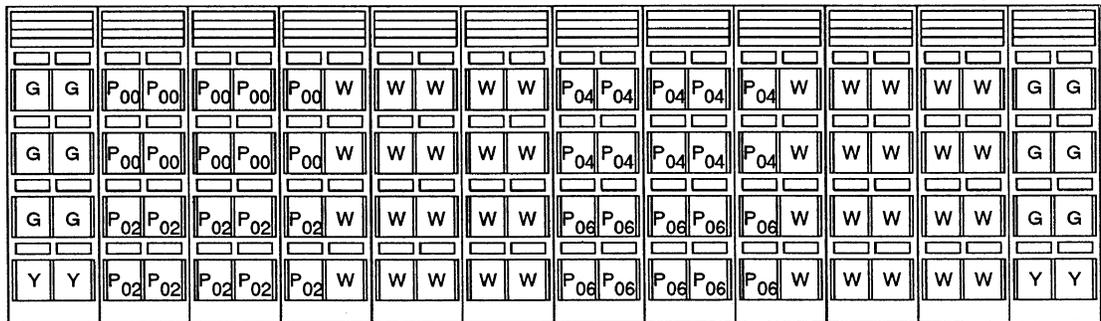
Zone Arrangement of Type-2 Frame — Plan View
